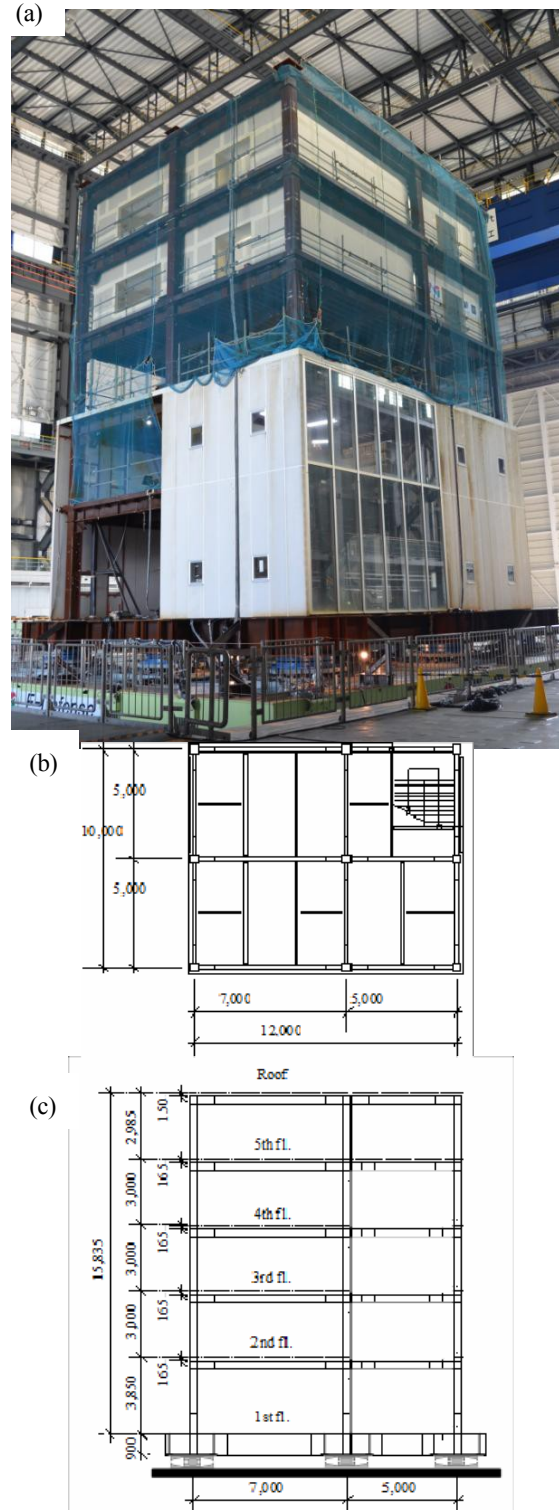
5-story steel moment frame specimen w/ triple pendulum isolators: (a) on shaking table, (b) plan view, and (c) elevation view.
